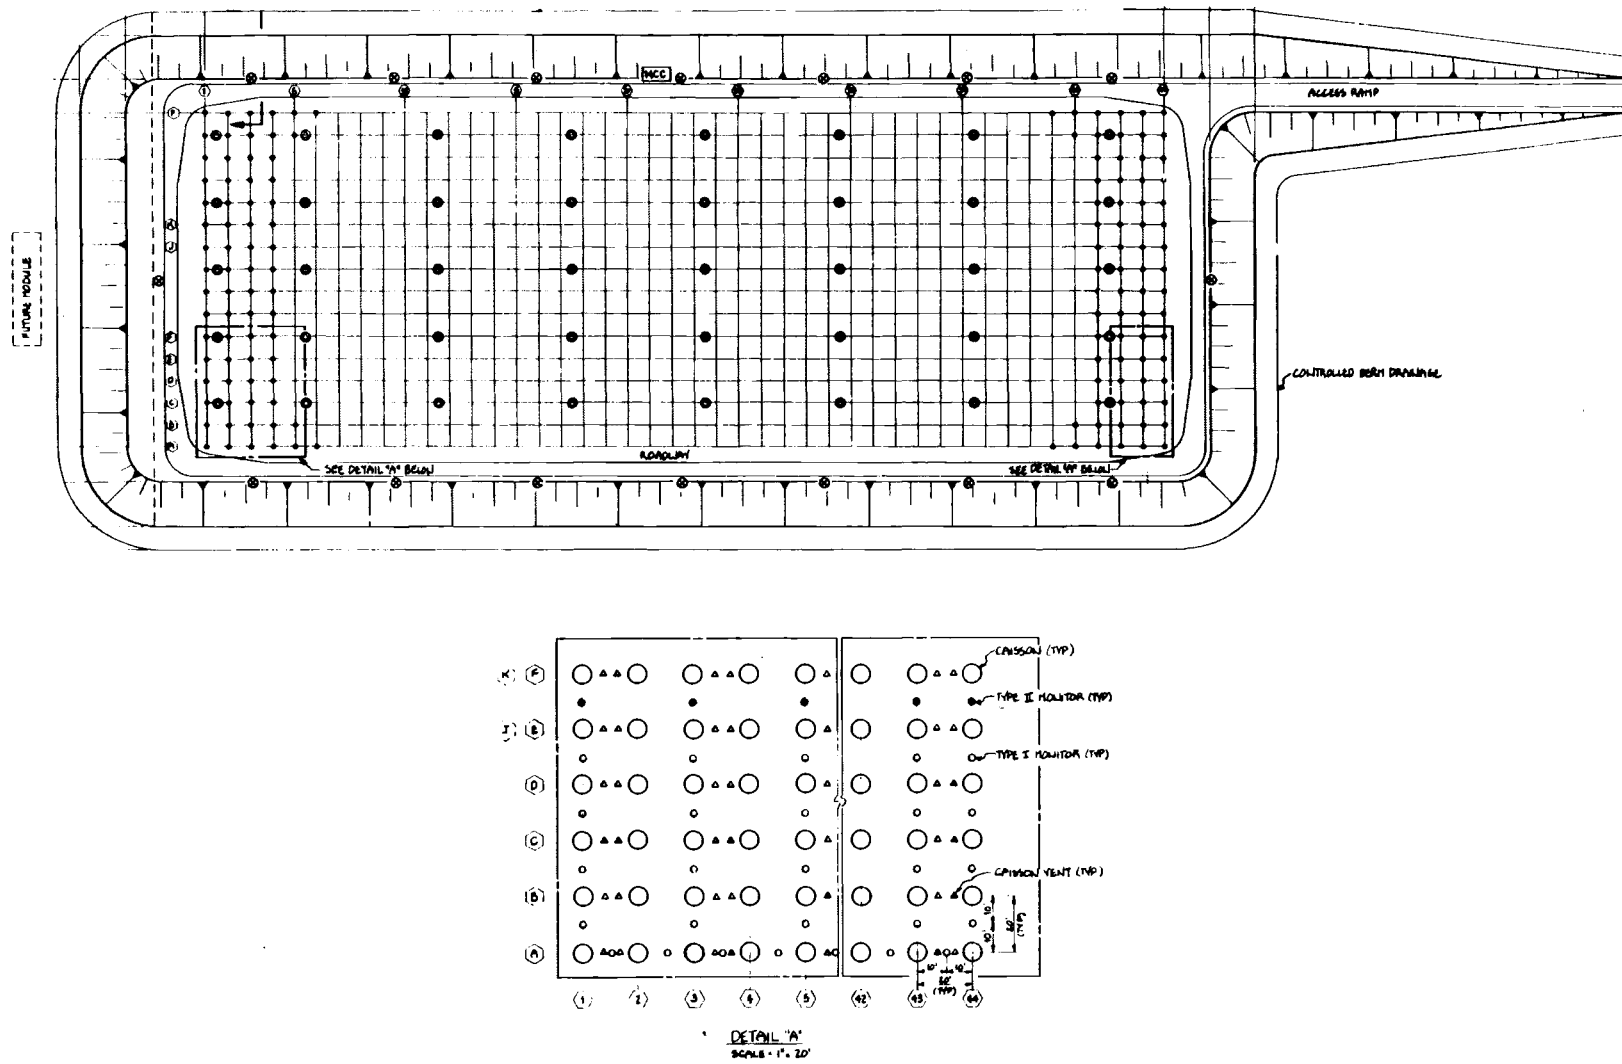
Typical Berm Module for Drywell Storage of HLW
